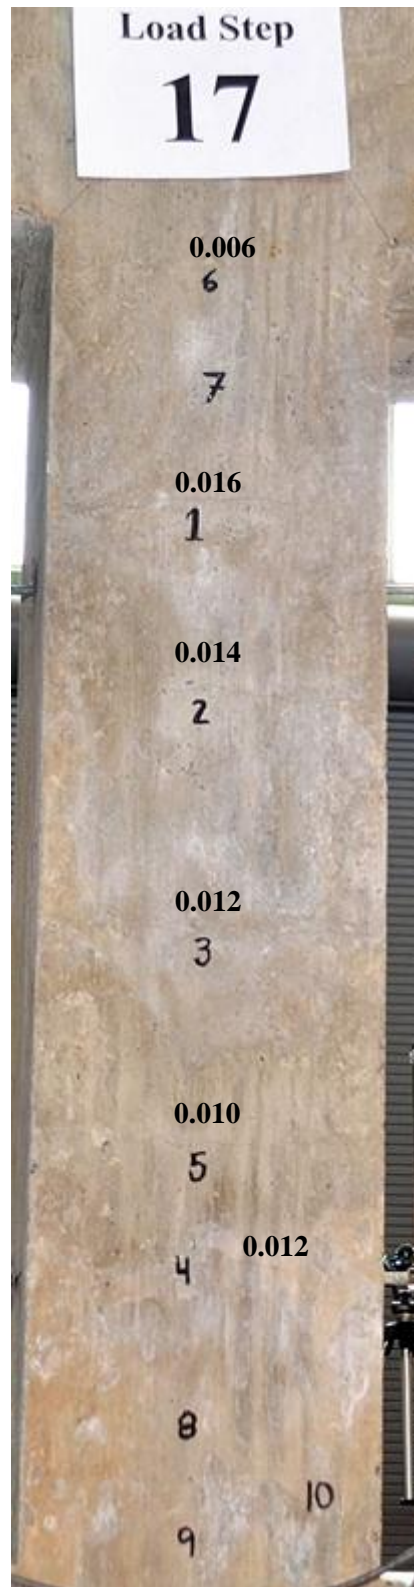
Cracks on east face of TS01 at Load Step 17
